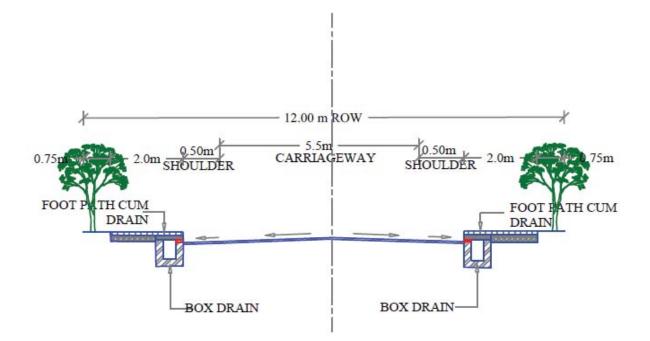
Typical cross section of 12m Right of way with 5.5m carriageway
